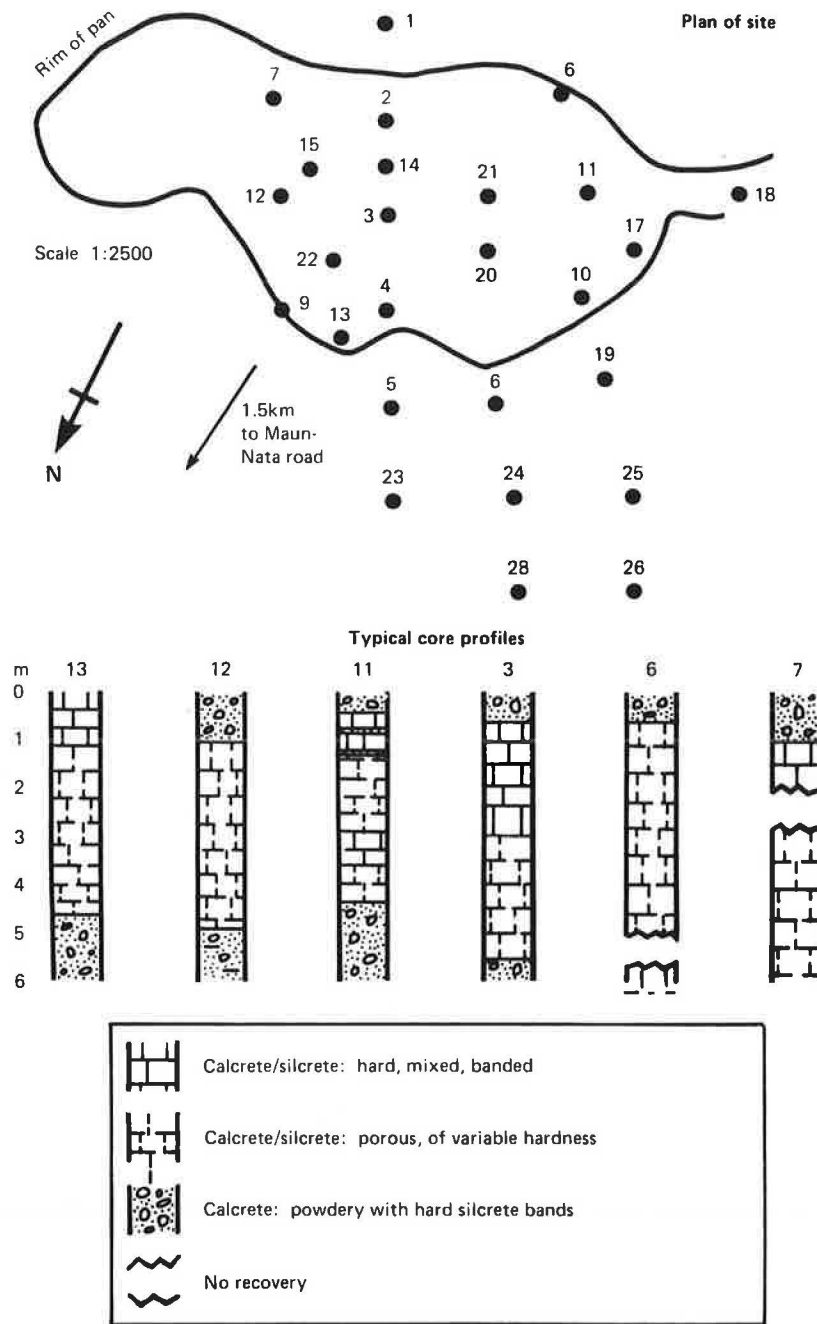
Borehole location and typical profiles at MN2 site on Maun-Nata Road.
